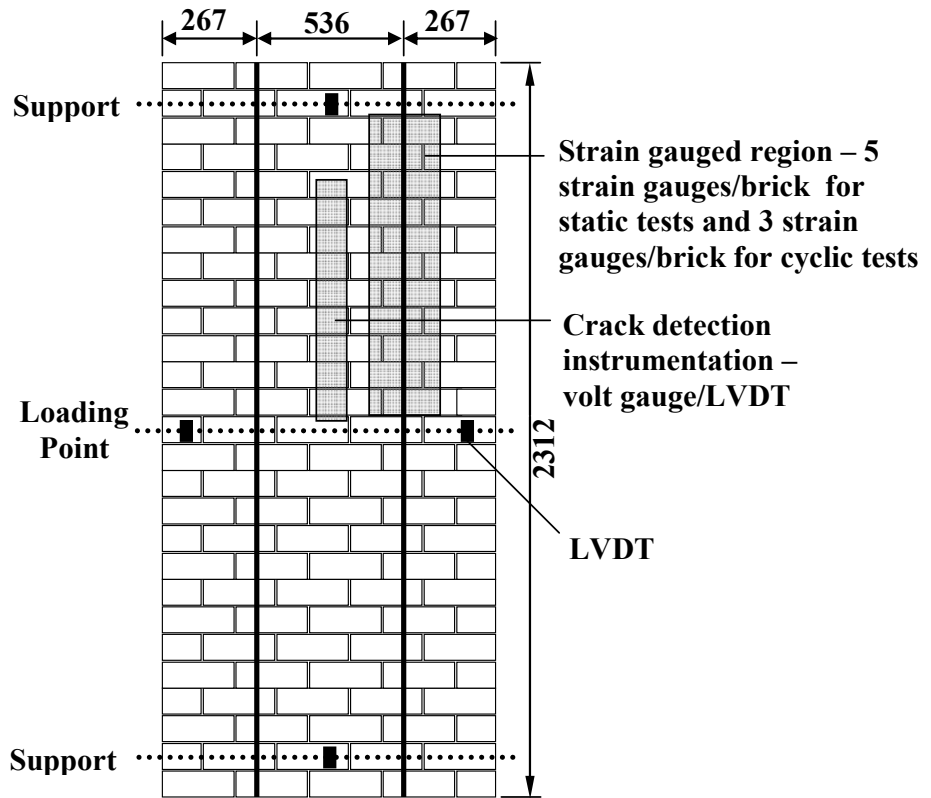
Instrumentation for walls reinforced with one strip (walls 5, 9)
